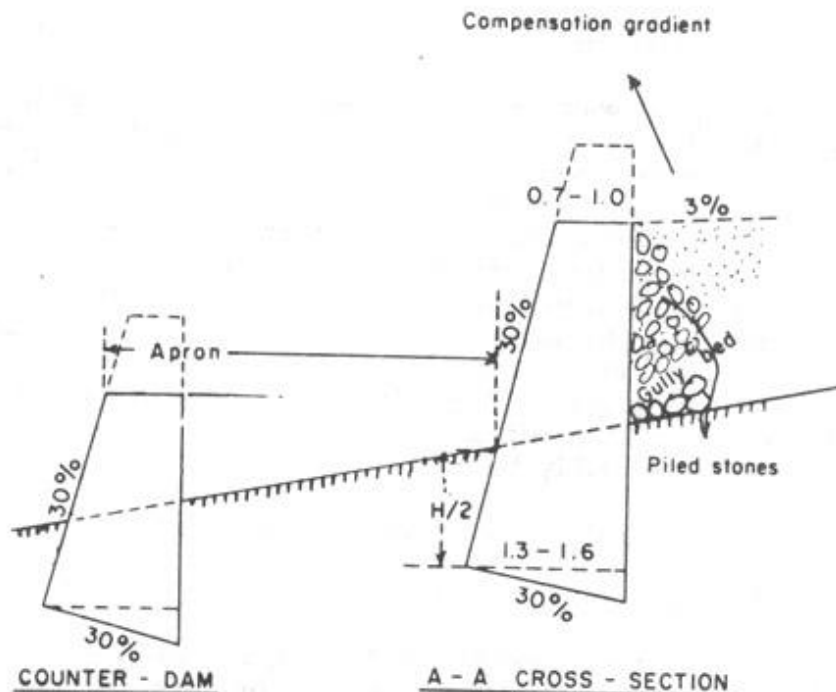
A-A cross section of the first boulder check dam and Counter dam
